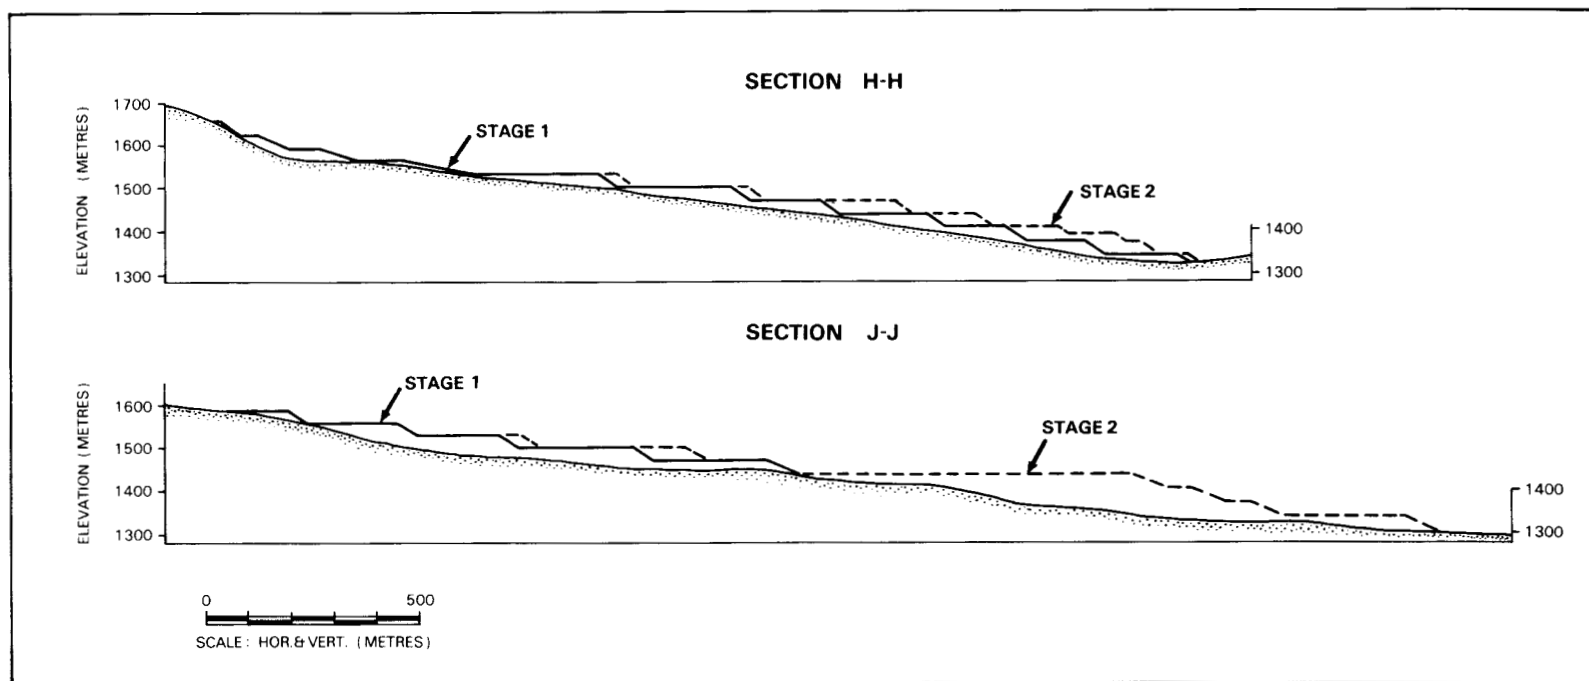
Cross-section profile of South Hill Waste Dump A (see Figure 15). Stage refers to stage of mine plan for South Hill (see Subsection 2.1). (From Golder Associates 1981.)
